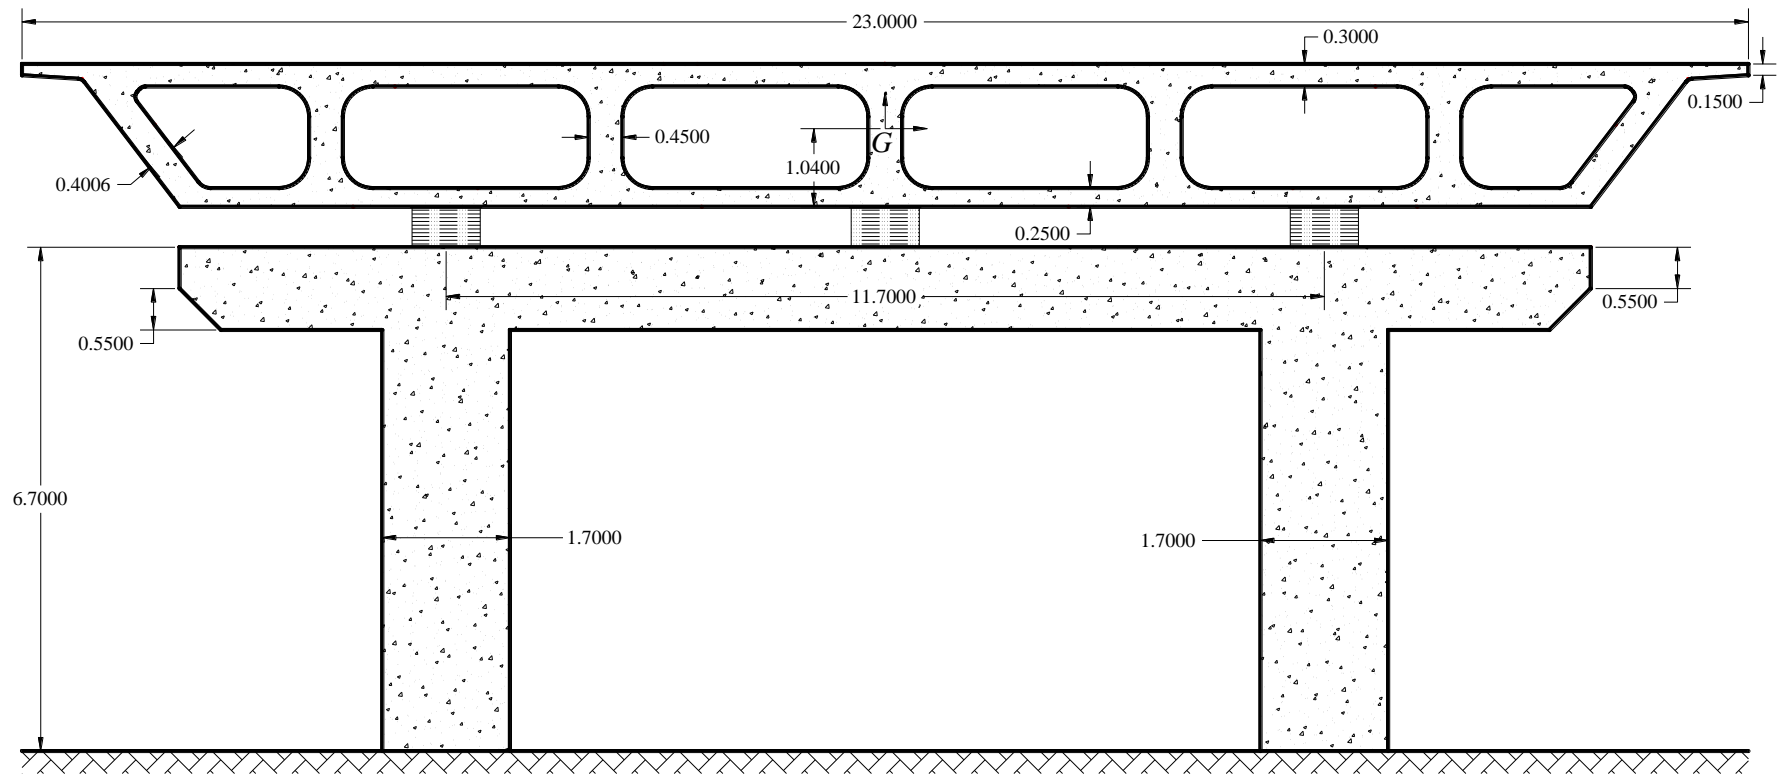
Cross-section of Bridge B. Units in meters.
